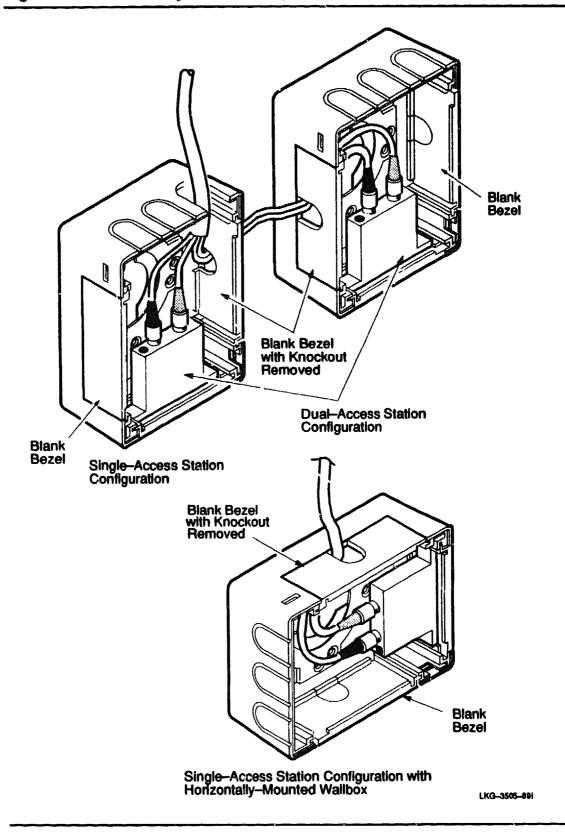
Fiber-Only Installation (2.5 mm Bayonet ST-Type Connector) and Fiber Cable Wallbox Storage
